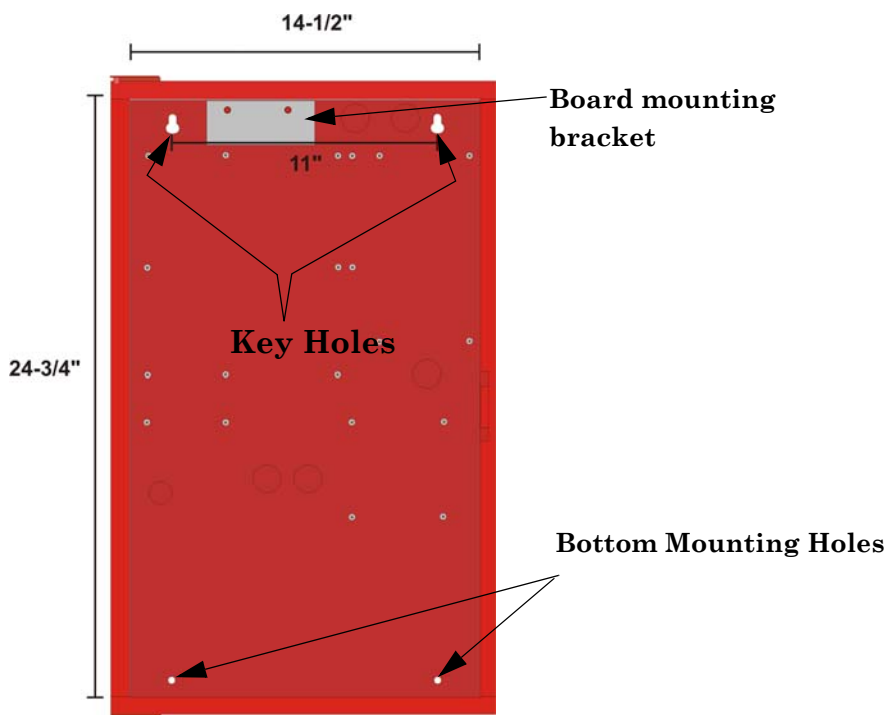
Cabinet Flush Mount Dimensions and Mounting Hole Locations
